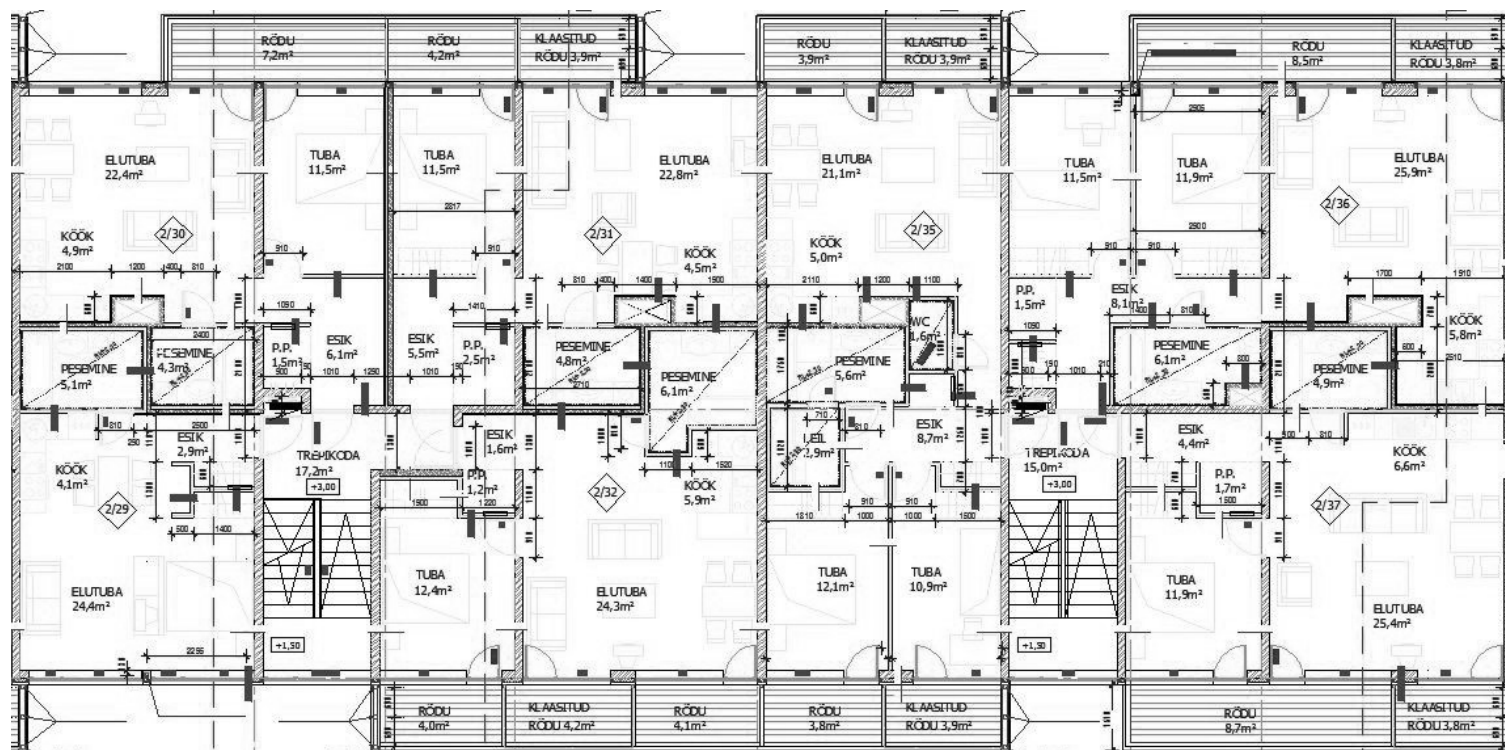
Ground floor and third floor plan of the four storeys reference apartment building, containing 7 apartments
